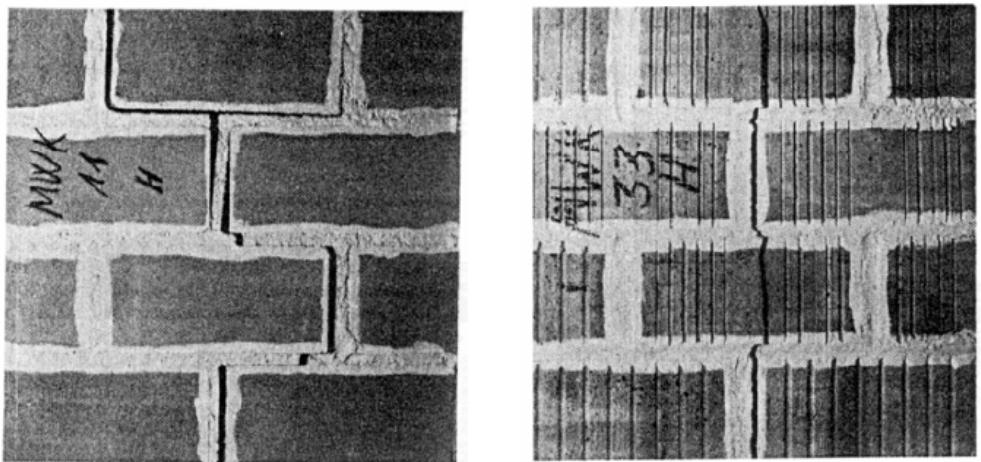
Failure mechanisms of the prismatic brick specimens [11].
